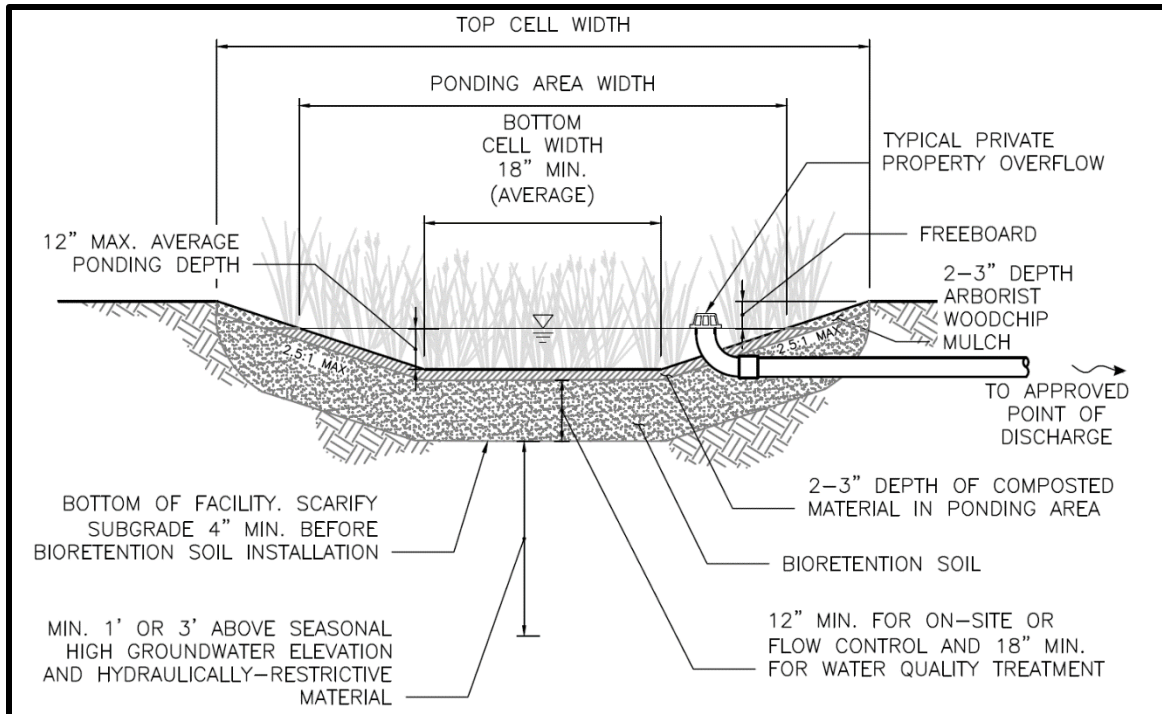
Infiltrating Bioretention Facility with Sloped Sides (without Underdrain).
